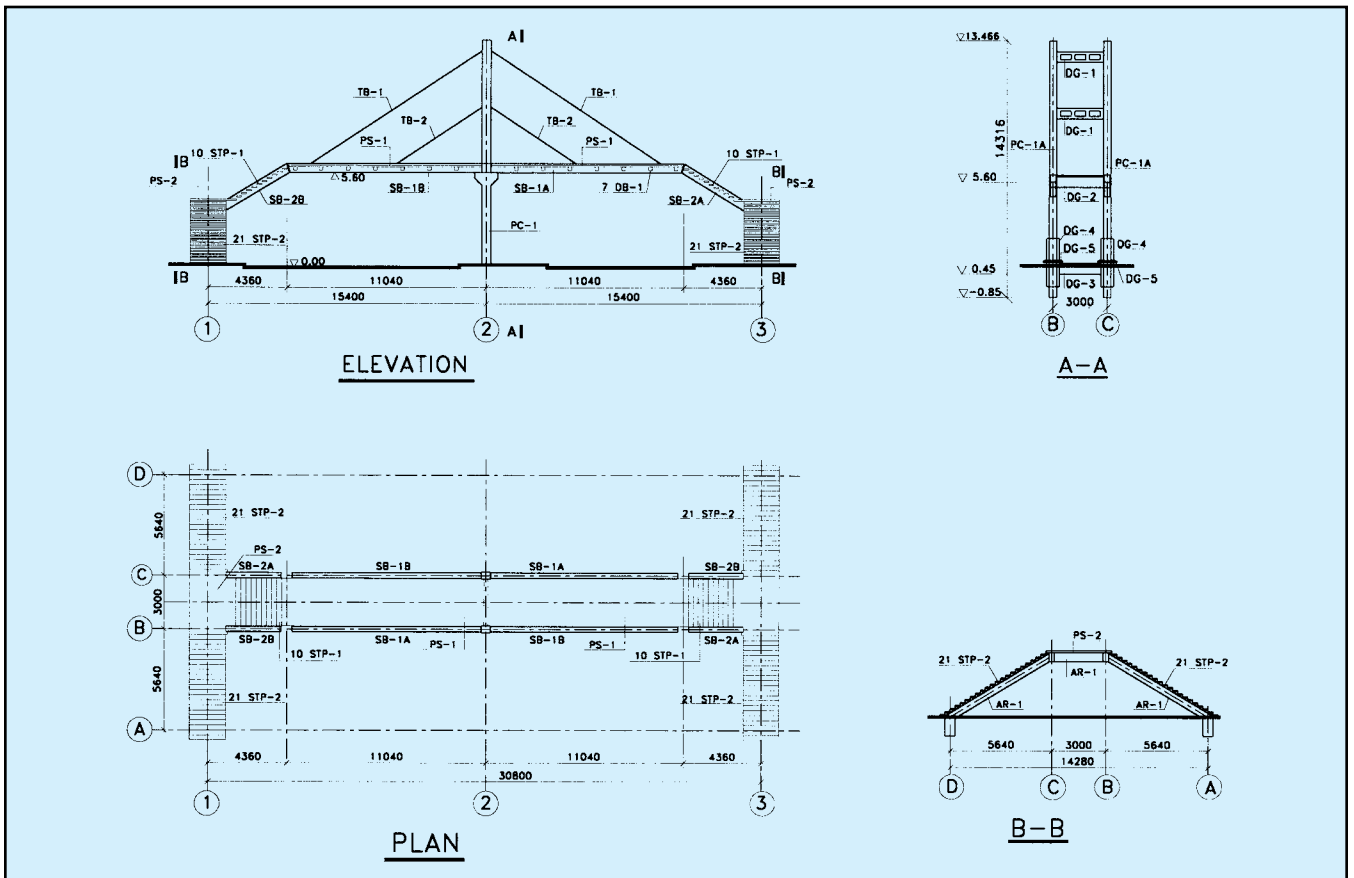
Plan, elevation and sections of bridge showing a breakdown of the various precast concrete elements in bridge (see also Table 2).
